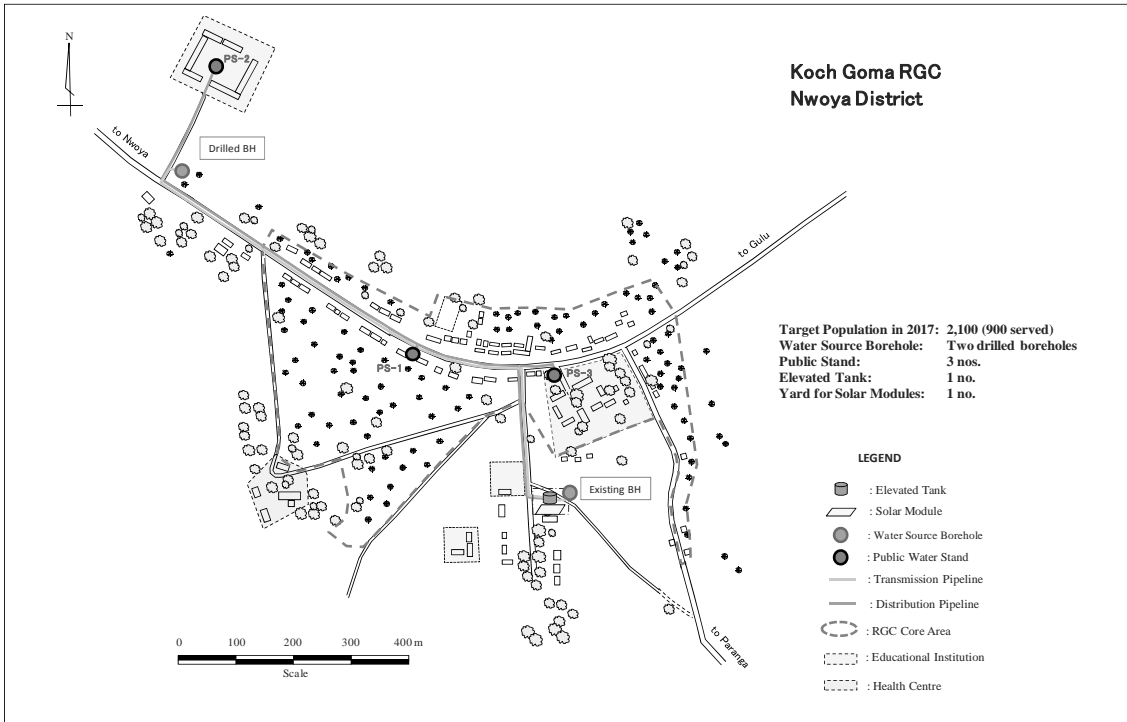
General Plan of Piped Water Supply Facility (Koch Goma RGC)
